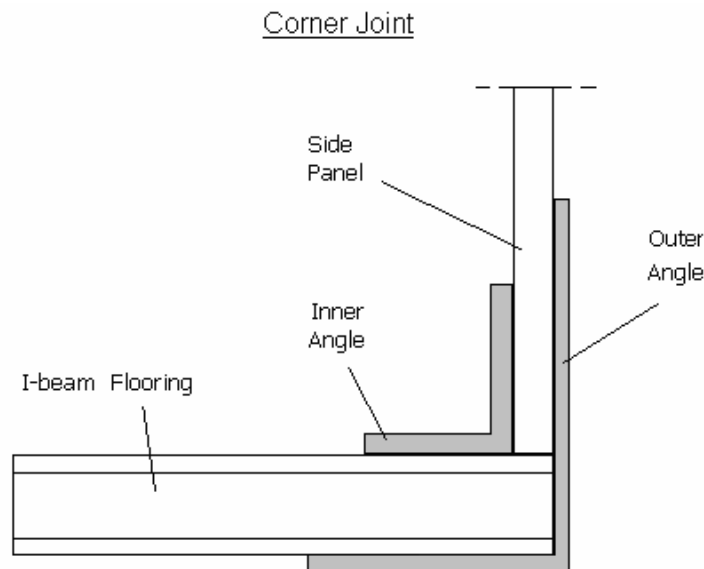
Alternative Option for the Corner Joint Connecting the Side Panels to the Flooring Platform
